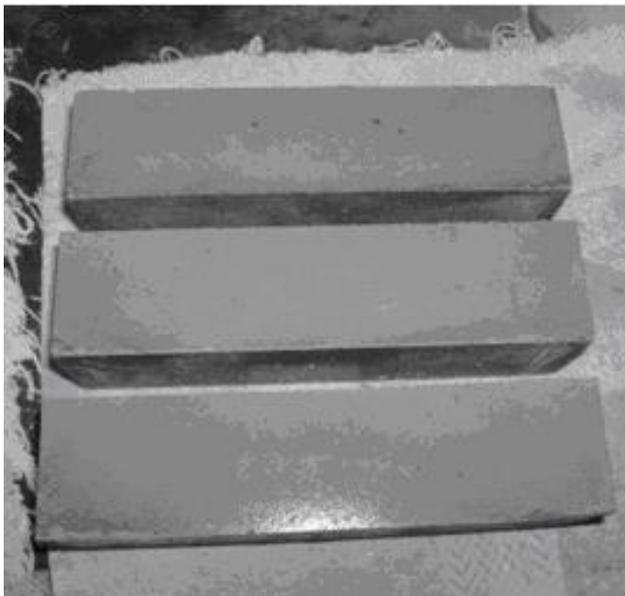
Prismatic specimens (40 x 40 x 160 mm)
